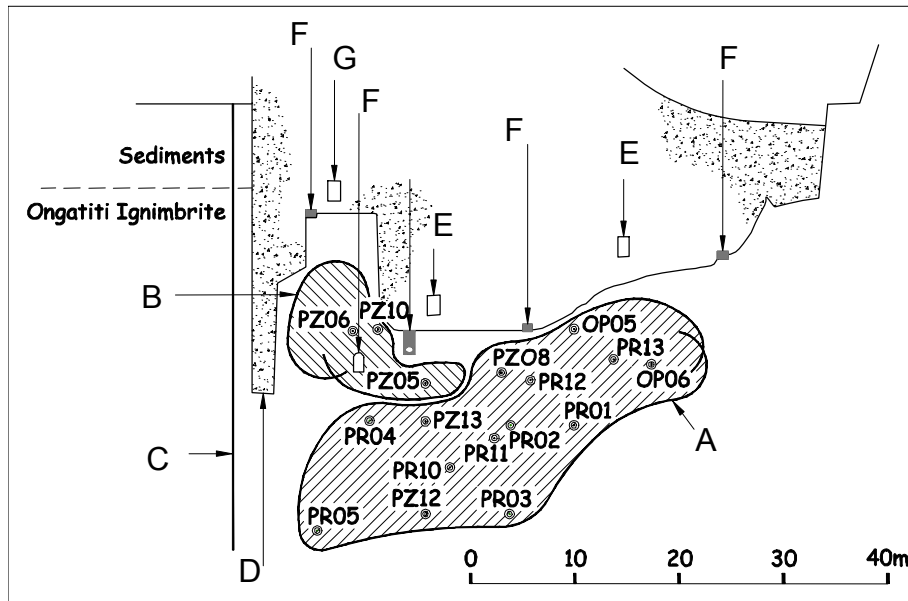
Elevation of defect showing intersections by investigation and grout holes drilled from the galleries and the downstream face.
